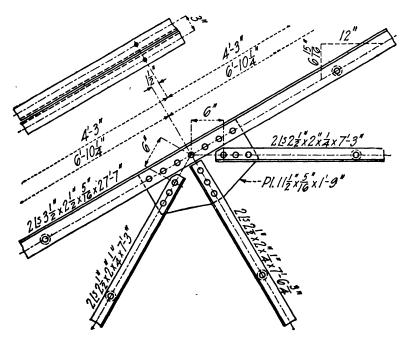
TRUSS JOINT, SKETCH DETAILED.
